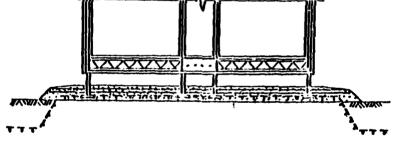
Contemporary types of surface foundations of the LenZNIIEP design:
